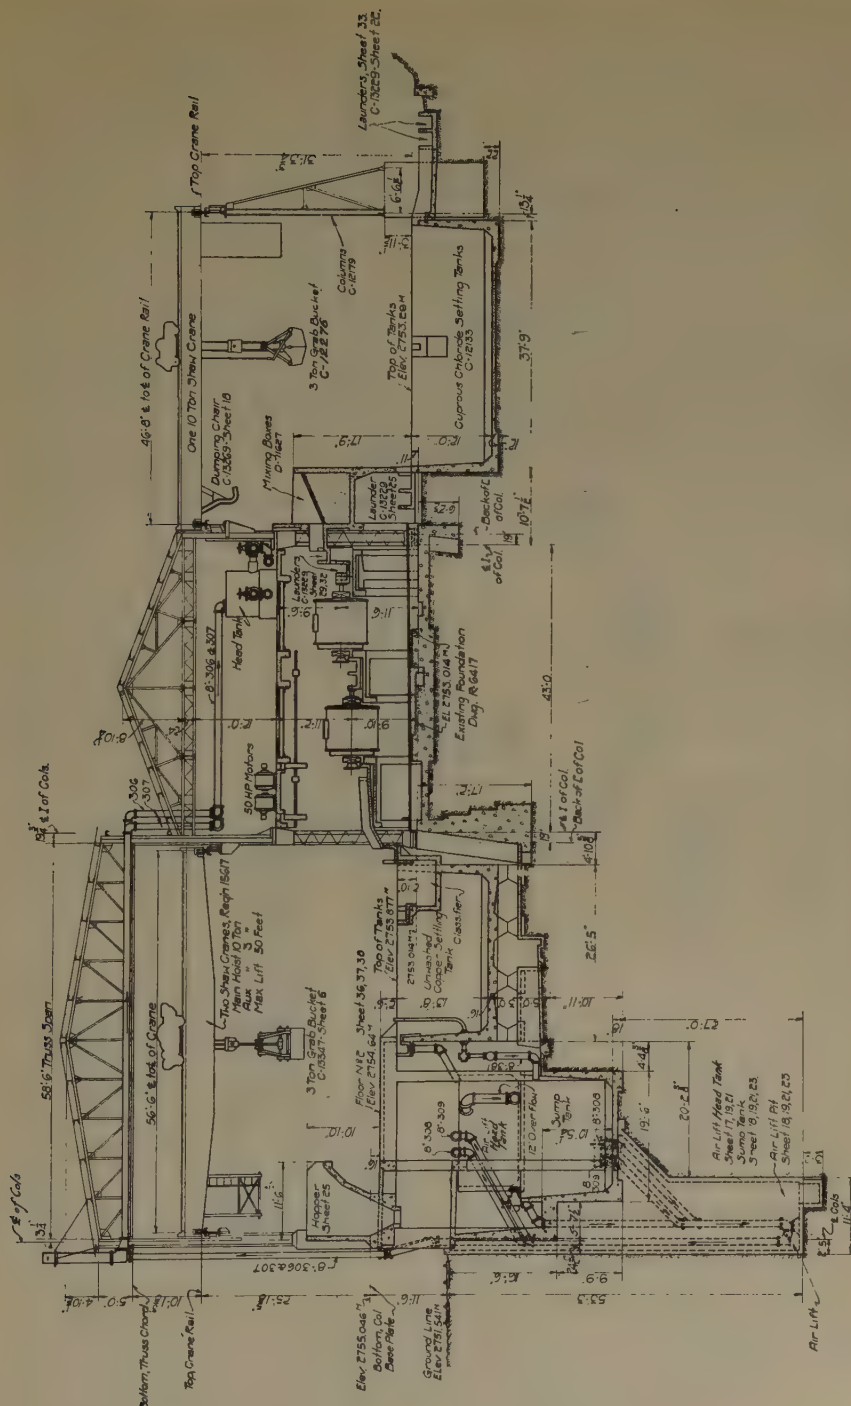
SECTION THROUGH WEST END OF DECHLORIDIZING BUILDING.
